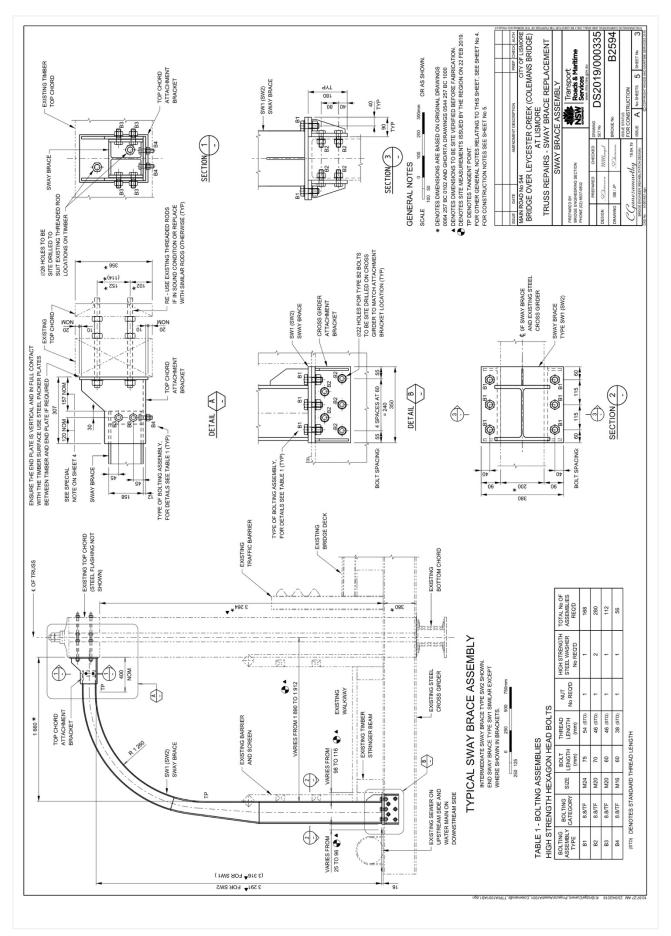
PROPOSED TRUSS REPAIRS – SWAY BRACE REPLACEMENT - ASSEMBLY
